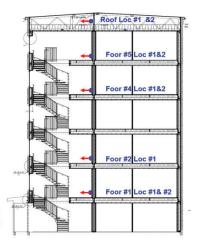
Building section along the EW direction showing the sensor layout at each level.
